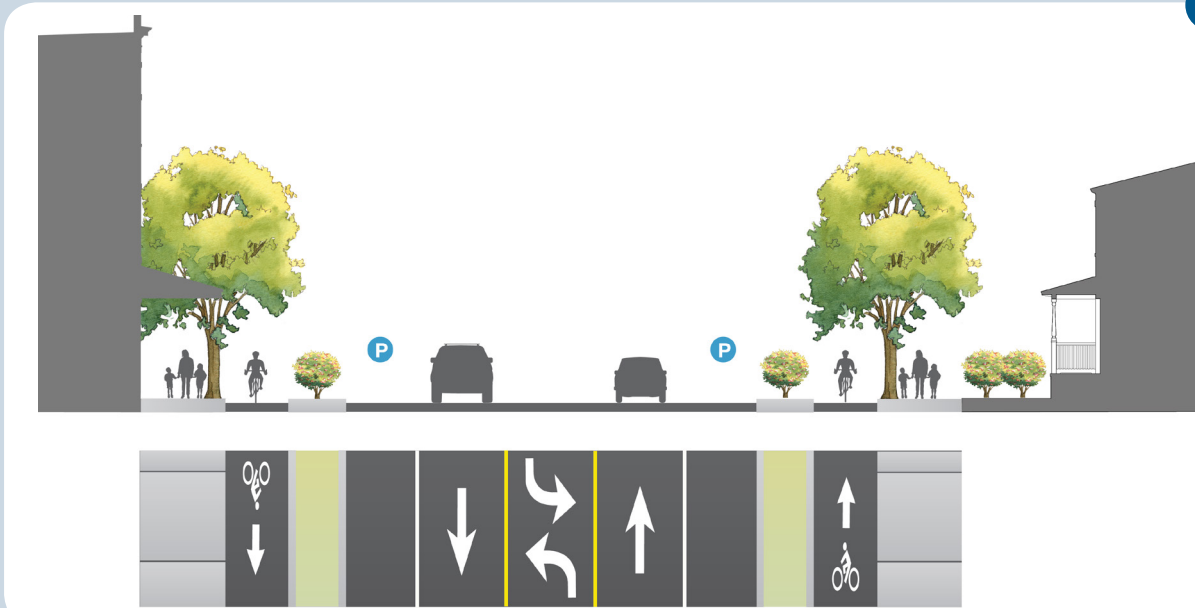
2nd Street (Between A Street and B Street) Proposed Improvements
